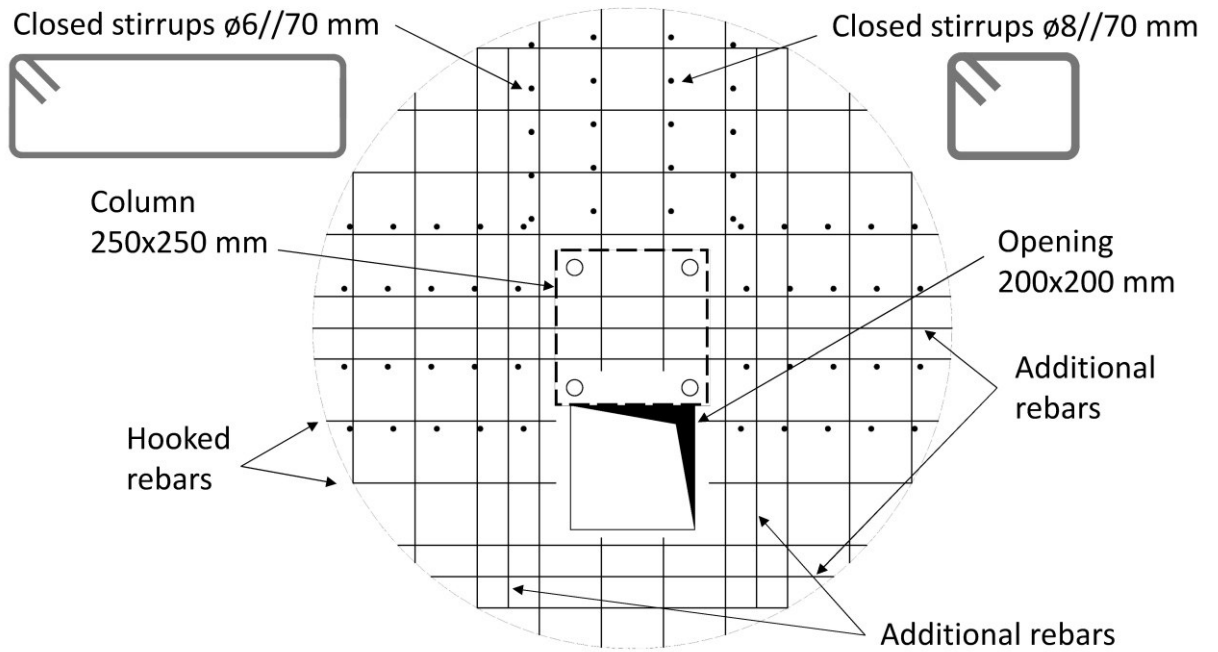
Shear reinforcement arrangement specimen SO2-03.
